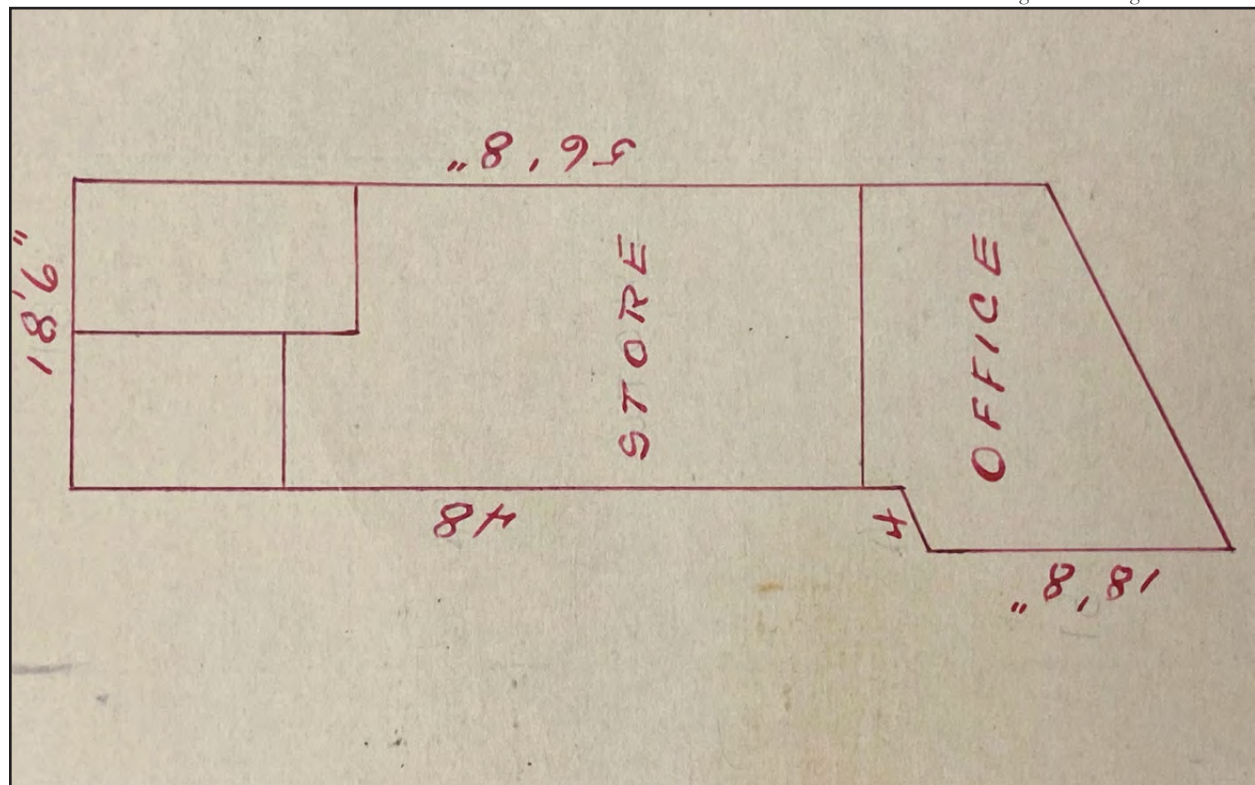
• 5015 Rainier Avenue S, historic floor plan from King County Tax Assessor
